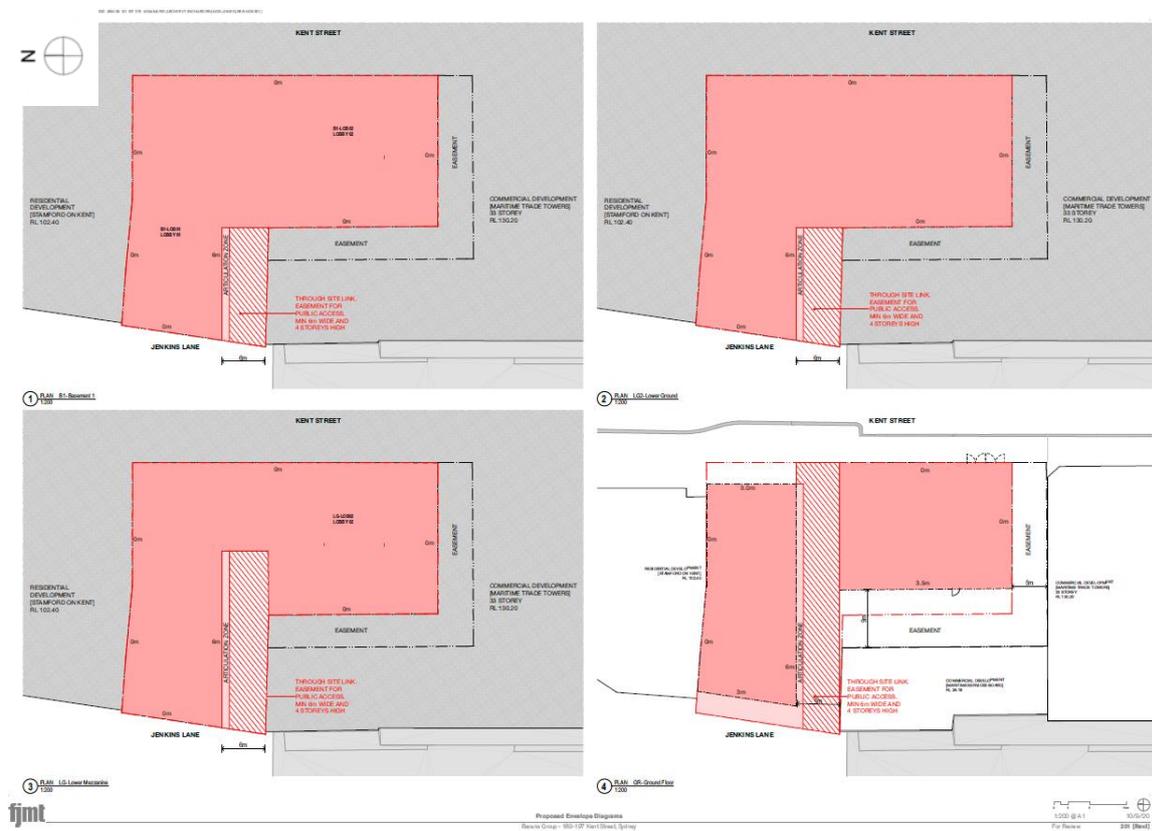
Proposed envelope plan diagrams, including basement, lower ground, lower mezzanine and ground floor levels
